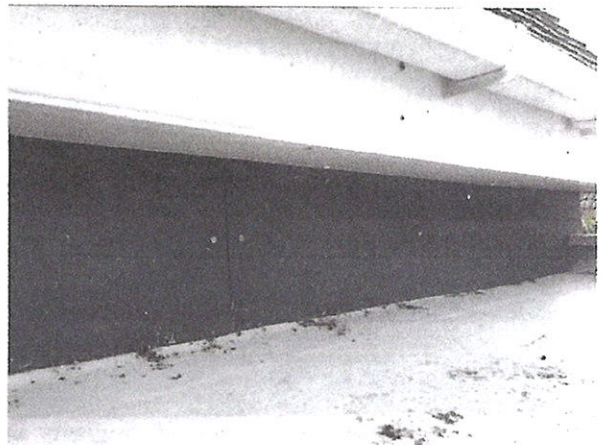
Showing the pitch of the roof as viewed from the adjacent flat roof.
